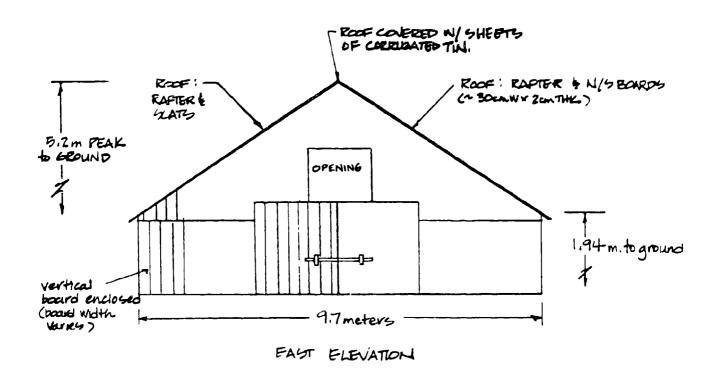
Field architectural drawing of the east elevation of the barn at 41DN191.
